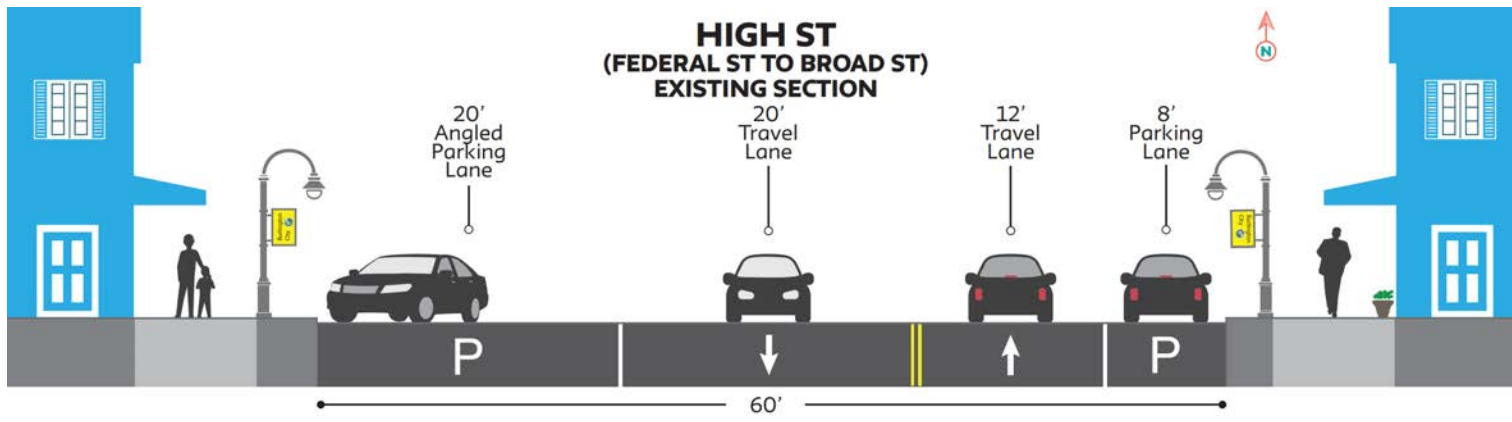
Existing Cross Section High Street - Federal Street to Broad Street
